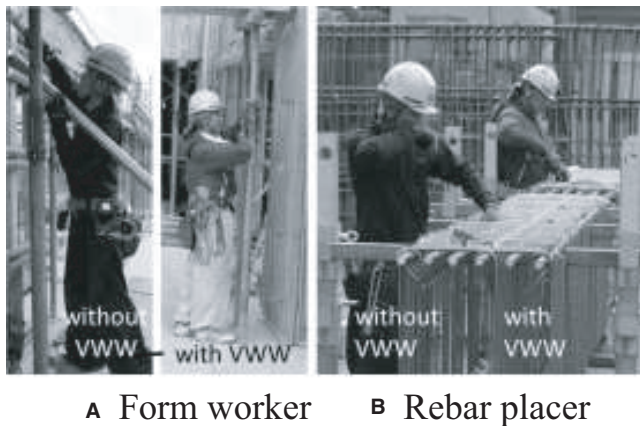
Working condition of each construction worker. (A) Form worker. (B) Rebar placer
